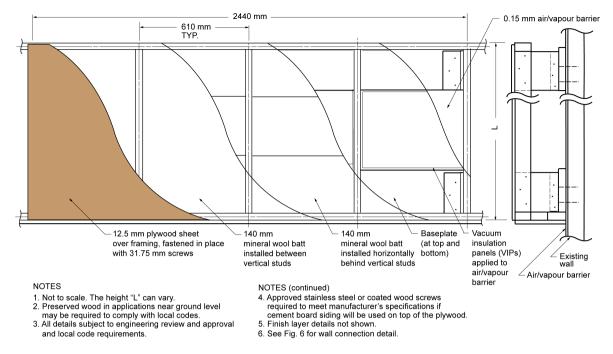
Detail of Vacuum Insulation Panel (VIP) installation to add RSI 11.5 nominal to an existing wall.
